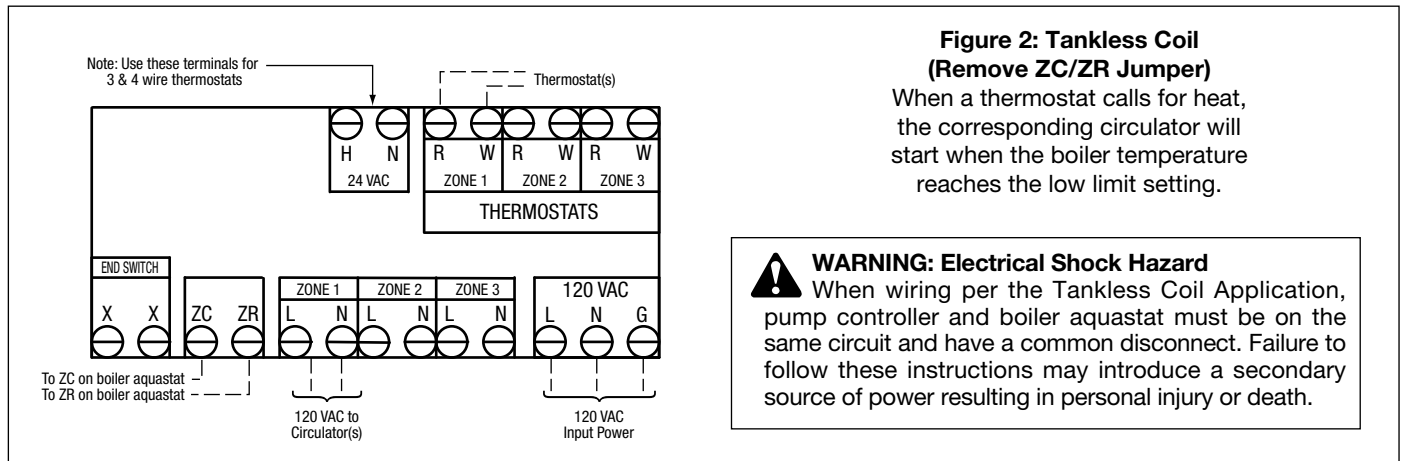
Tankless Coil (Remove ZC/ZR Jumper)
